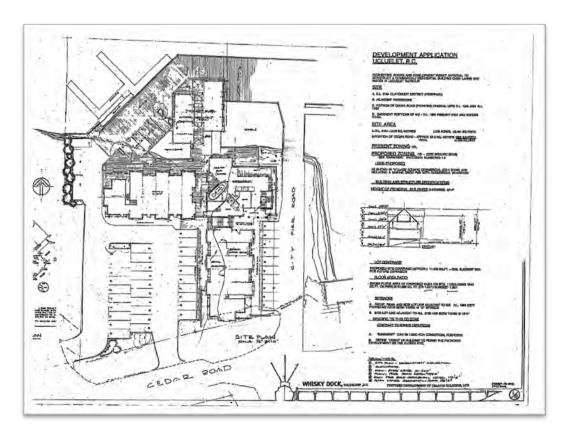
Site plan demonstrating wharf extension that was proposed for Whiskey Landing. Note marina extension with drive lane, parking stalls, and pub built out over the water lease DL 2167.
